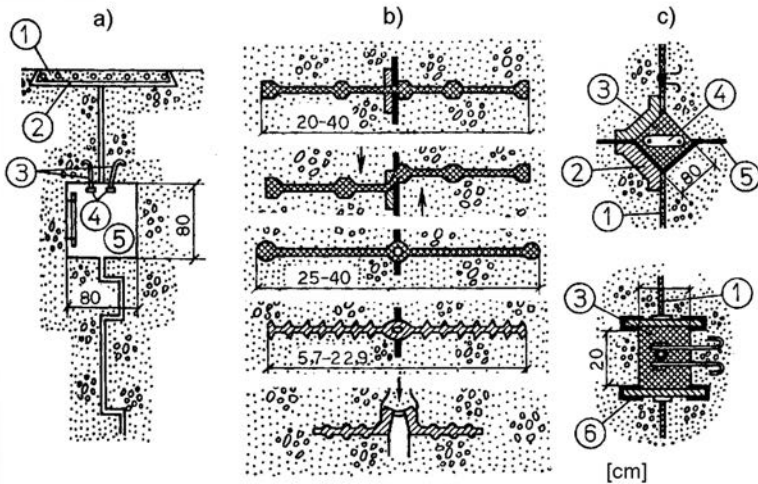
Basic internal seals and waterstops in dams on rock foundations. (a): (1) Reinforced concrete slab; (2) bituminous base; (3) anchors; (4) copper sheet; (5) manhole; (b) rubber waterstop; (c) asphalt wedge – big and small: (1) joint; (2) reinforced concrete channel; (3) asphalt mastic; (4) electric heater; (5) metal sheet; (6) seal.
